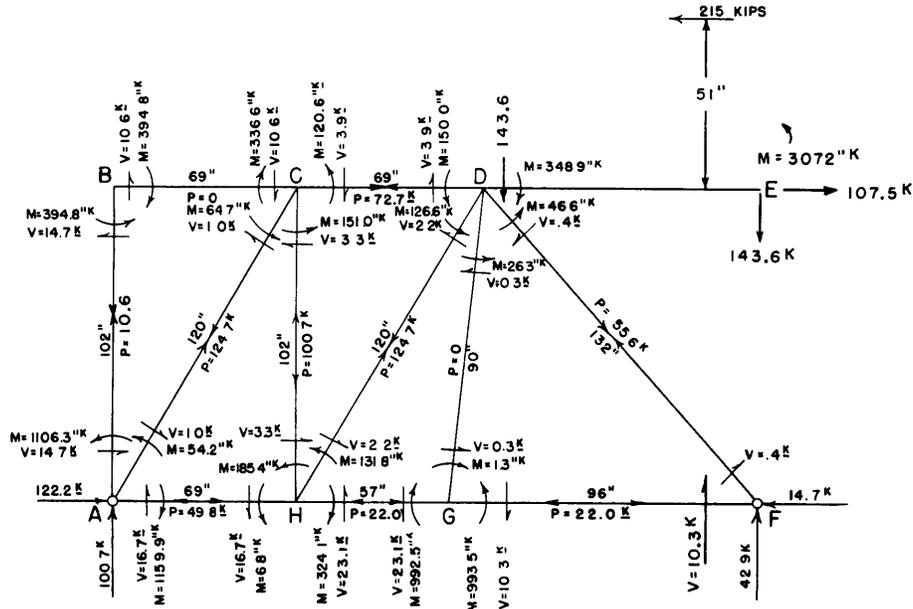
Schematic Diagram of Truss Showing Loads, Reactions, and Elastic Behavior As Determined from Design Calculations
